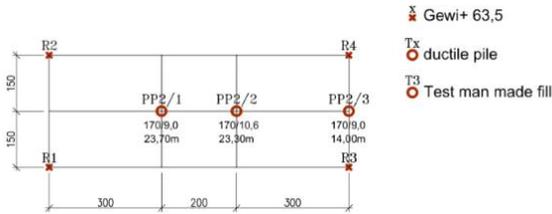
layout of compressive and tensile static load tests (test pile PP2/3 shorter in order to evaluate skin friction and bearing capacity of the man-made backfill)
